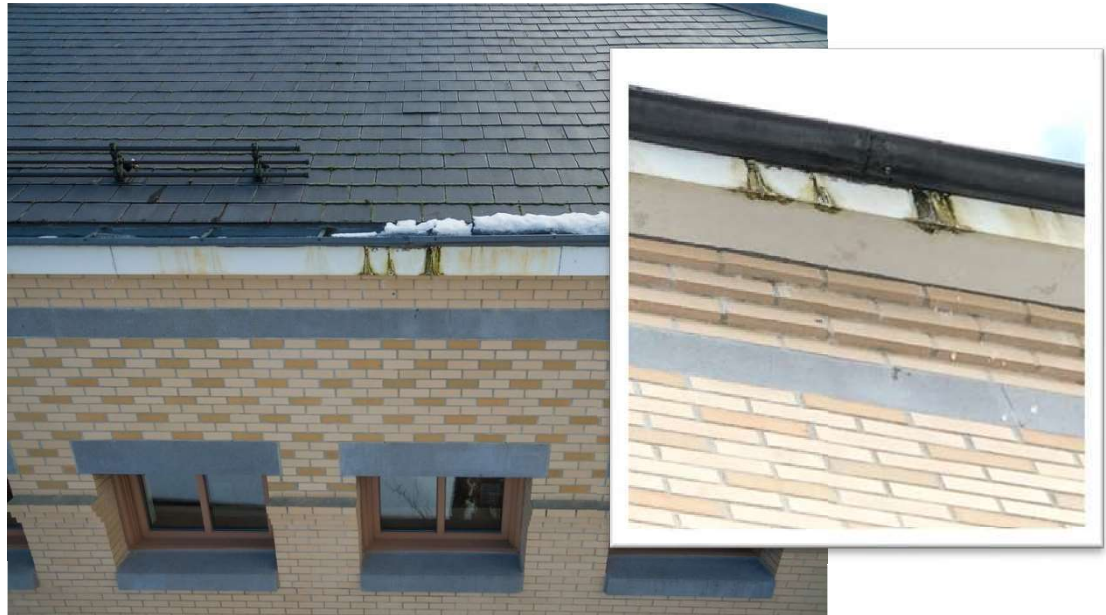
View of damaged gutter at the north elevation. The damage appears to be from snow and ice build-up in the gutter and has resulted in the separation of the gutter joint, active leaking, and discoloration of the fiberglass cornice.
